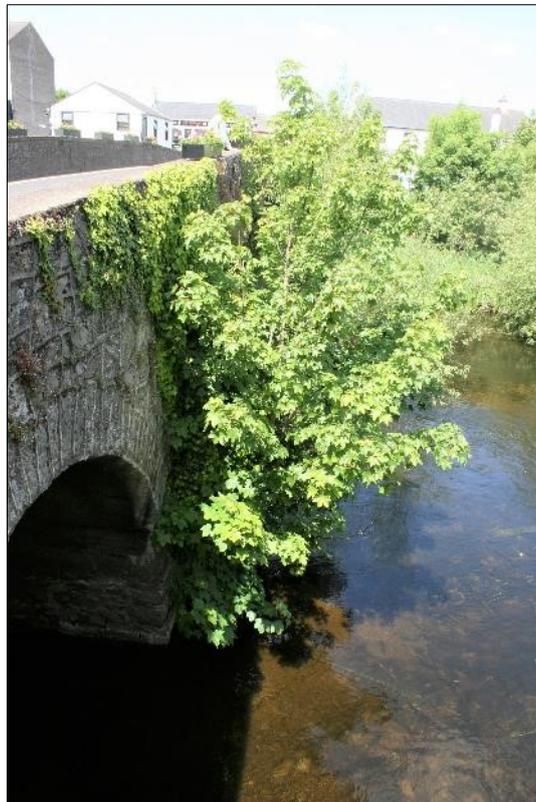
Sycamore tree rooted into pier on north-east elevation looking north-west
